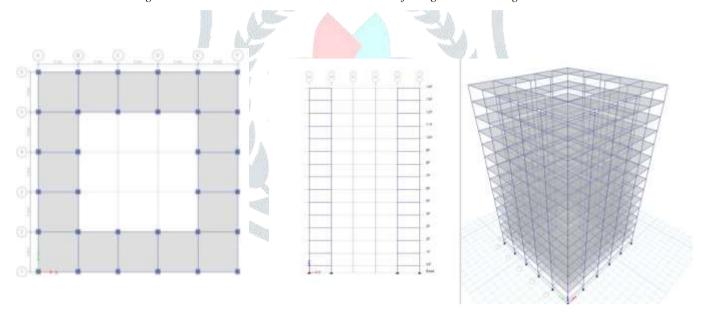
Plan view and elevation and 3D view of Irregular-2 building model
